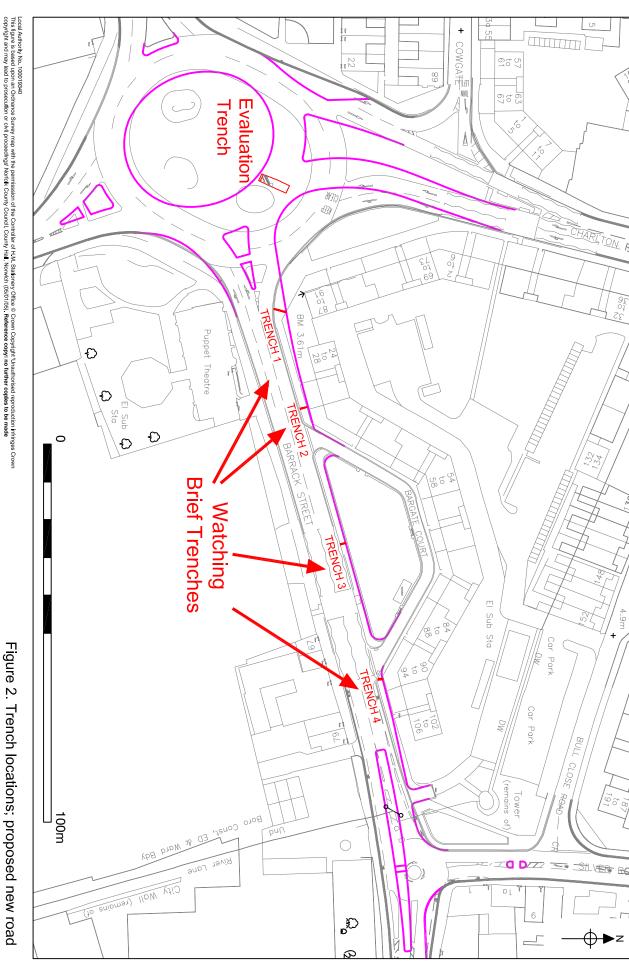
Trench locations; proposed new road layout in magenta. Scale 1:1000
